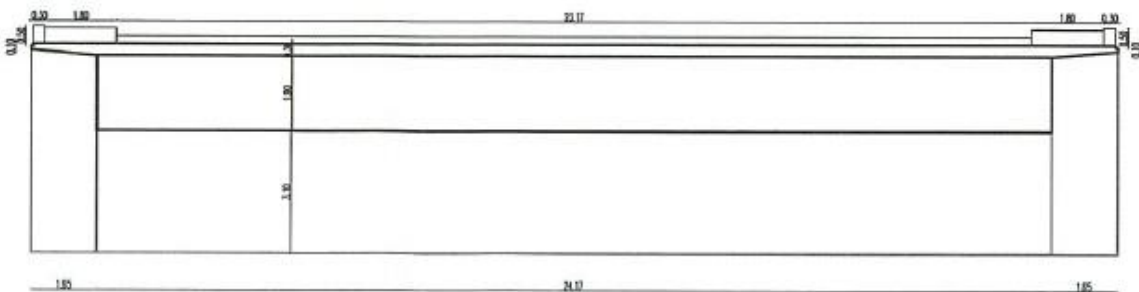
Cross section of arch slab near the fixed ends (section 4-4)
